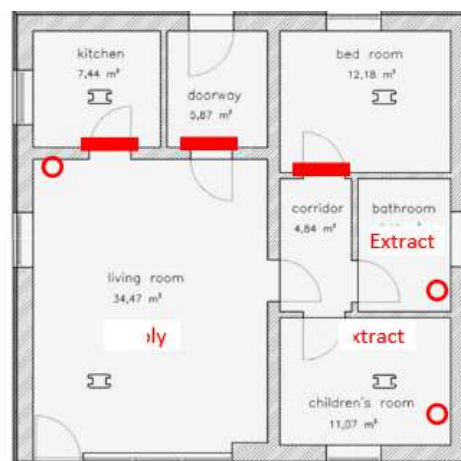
Holzkirchen houses: sealed internal doors and ventilation air vents.
